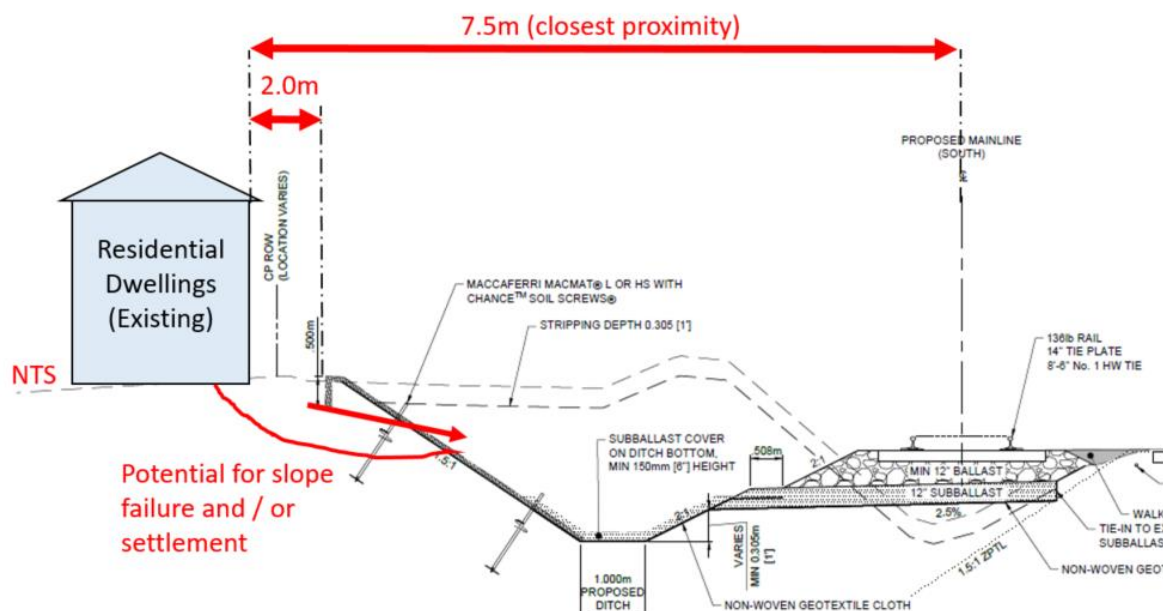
Ground Destabilization / Potential Slope Failure, CP, 2023, with City Edits
